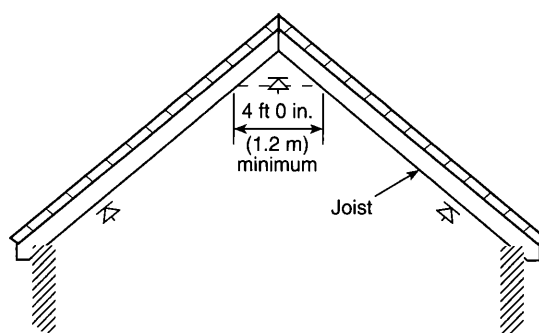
(a) Sprinklers Under Pitched Roofs with Sprinkler Directly Under Peak; Branch Lines Run Up the Slope.
